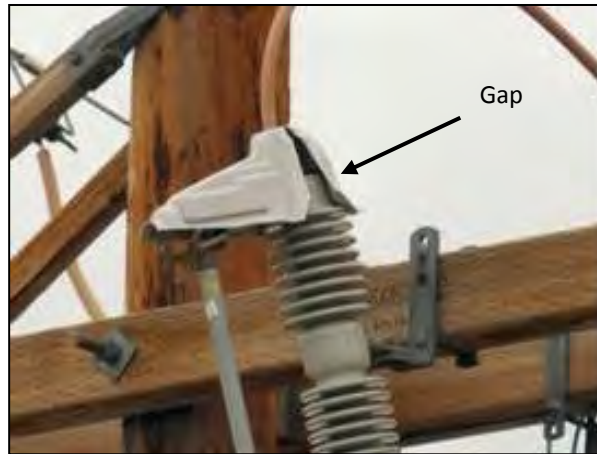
Cutout cover with gap due to large-diameter stinger wire and cover.
